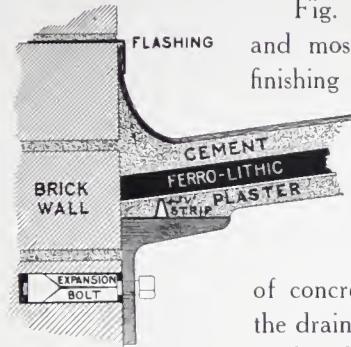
shows the easiest and most efficient method of finishing against an adjoining or parapet wall. The pitch necessary to drain the water is made by diminishing the thickness of concrete in the direction of the drain, or by the pitch of the roof itself.
